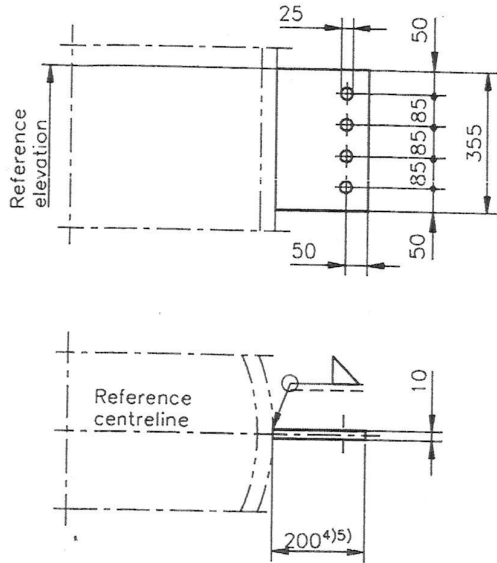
Clip, type 1D, welded to vessels without insulation or with heat insulation
